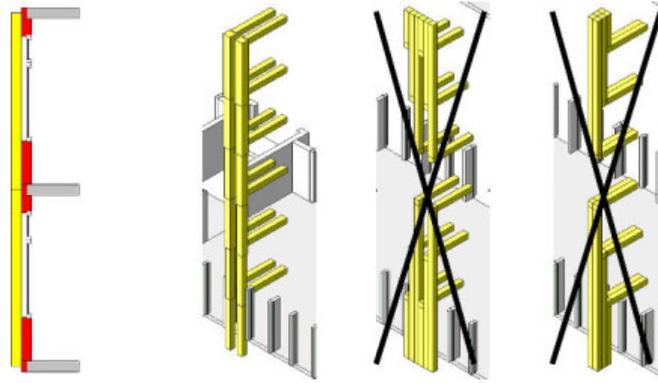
left: façade intersection with additionally mounted modules, right: discussed ventilation ductwork inside the façade elements
